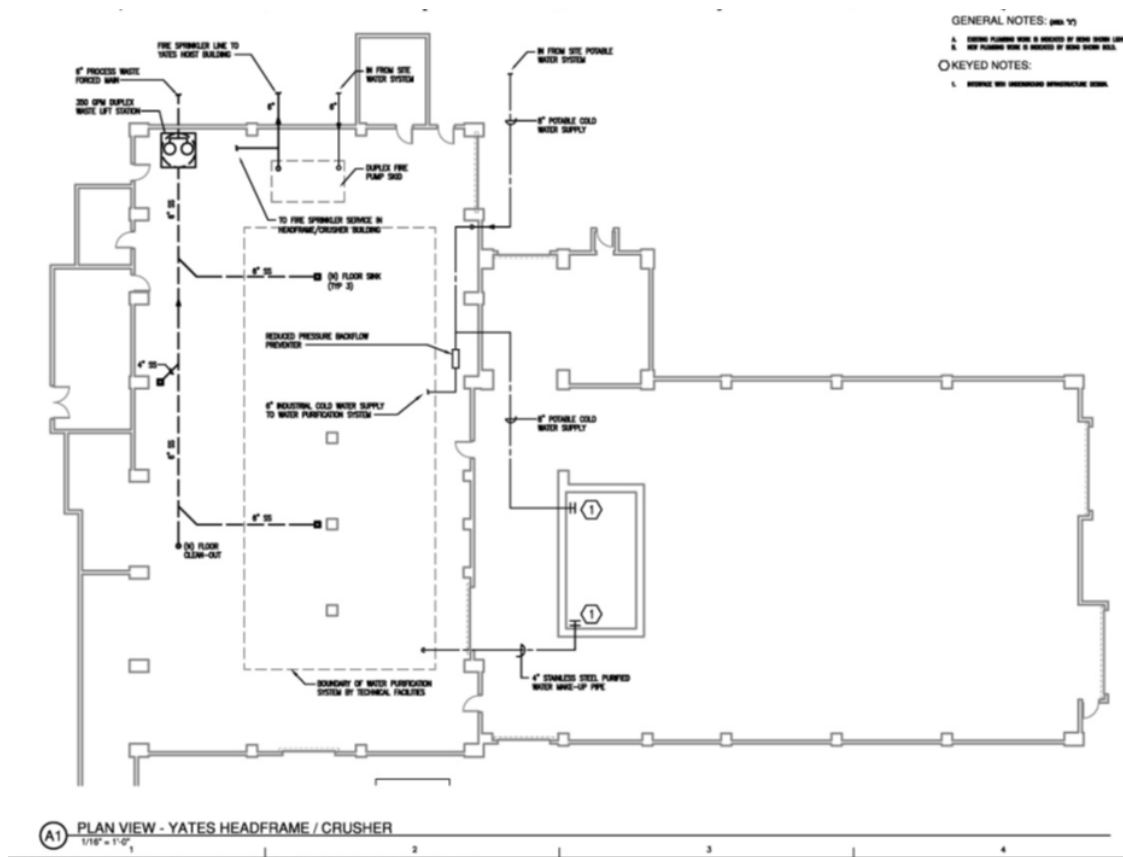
Yates Headframe crusher building plumbing plan. (HDR)
